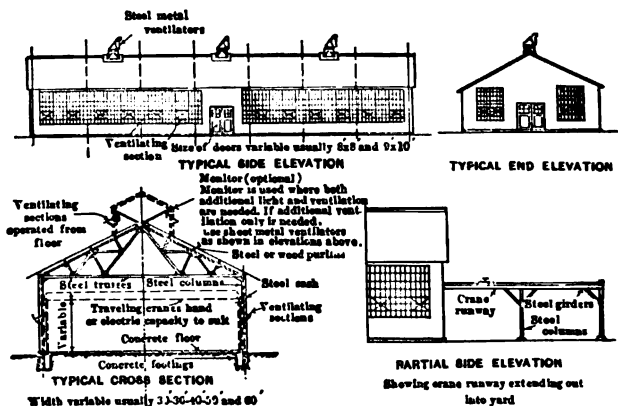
Elevations and cross section of a typical Austin standard building.
